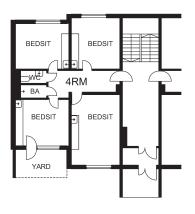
Excerpt from the original plan of the ground floor of a 3-floor slab block with bedsits for students. Adapted from documents courtesy of Harri Hagan.
